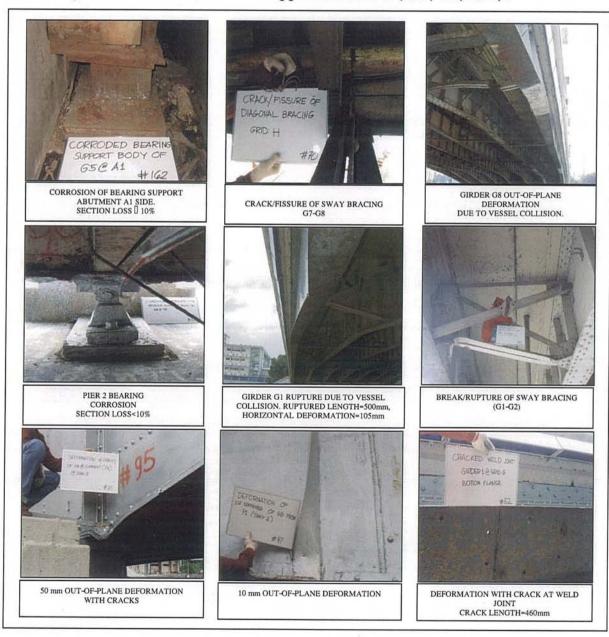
Close-up Visual Inspection of Major Damages in Jones Bridge
